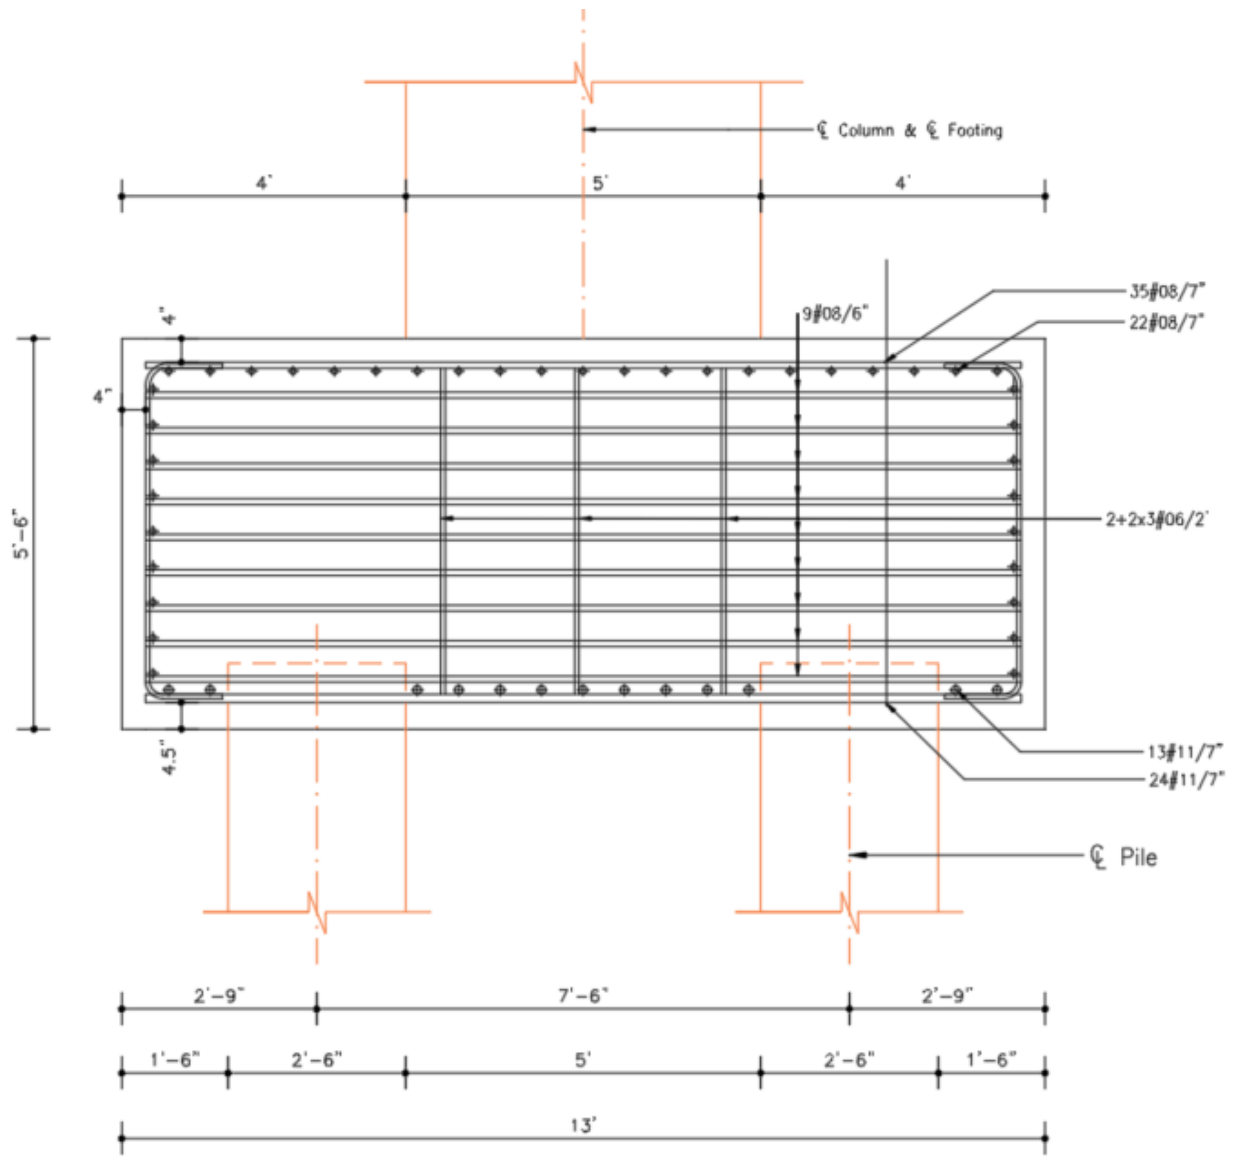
GFRP reinforcement layout (transversal view) – Pile cap 6-pile group “B” of the selected Pier n.24 of the Eastbound Bridge
